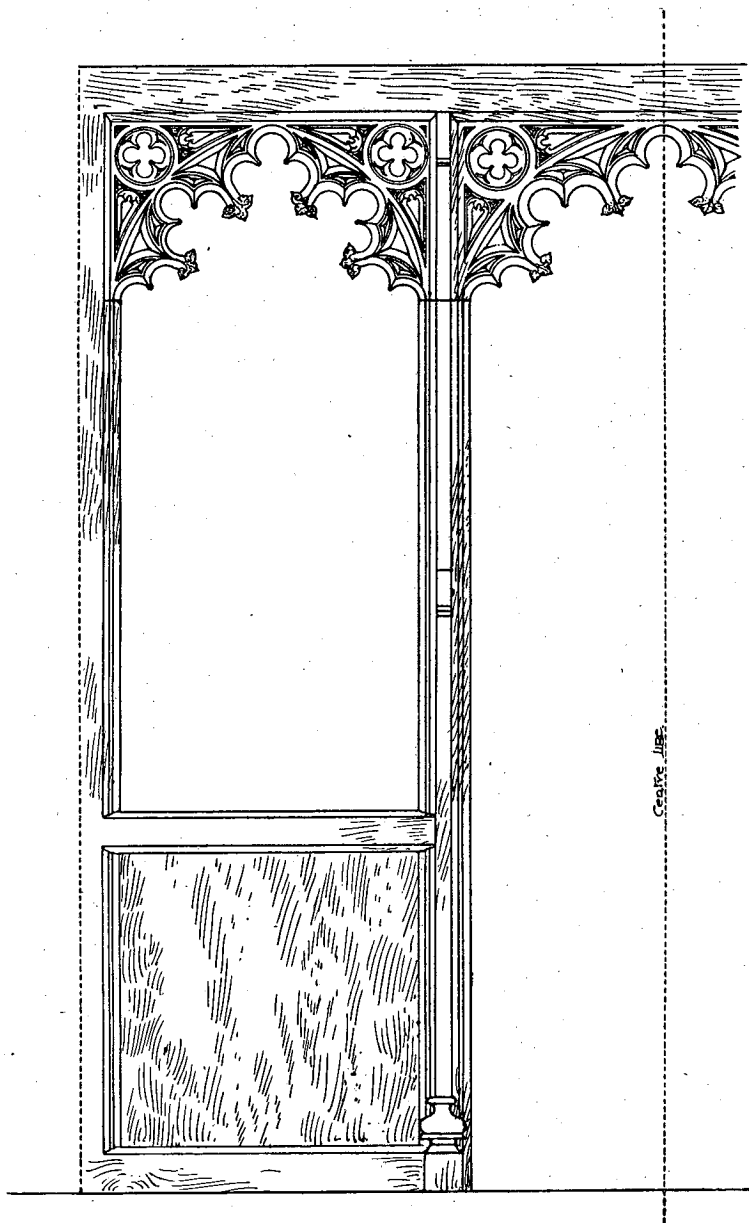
Triplo. Elevation of XIV cent. Rood Screen. (Shewing the triple arcade in oak.)
